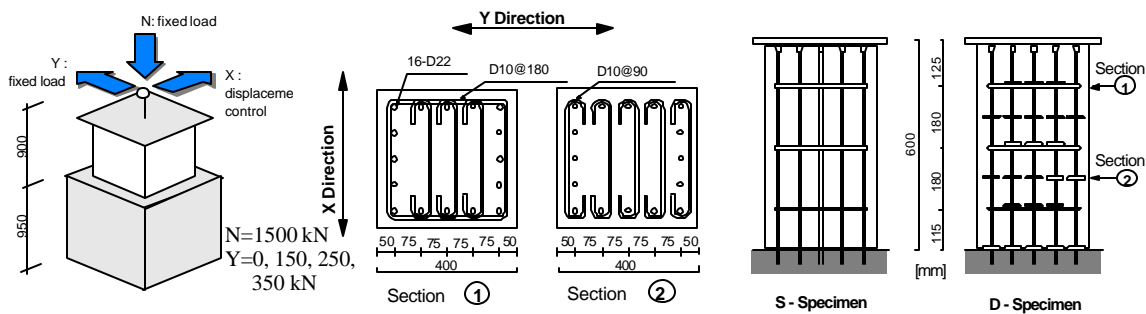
Setup and reinforcement layout of short RC column loaded in bi-axial shear.
